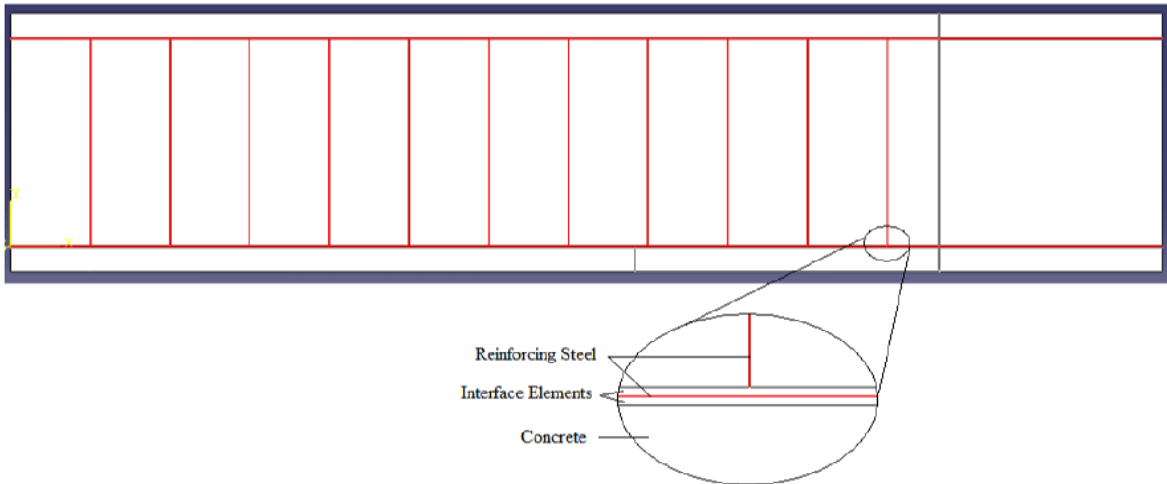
Snapshot of rebar-concrete interface modeling.
